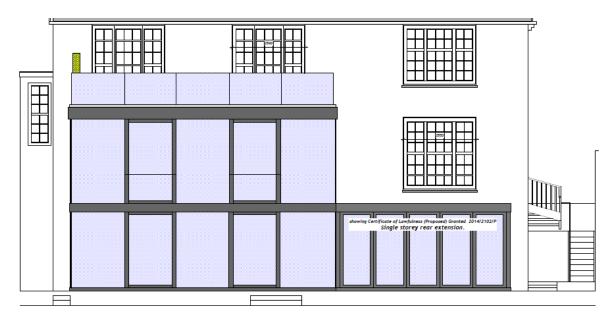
(above): Drawing of the rear elevation as existing and also including the (as yet unbuilt) single storey rear elevation that does not require planning permission and was confirmed as permitted development as part of lawful development certificate application ref. 2014/2102/P.
